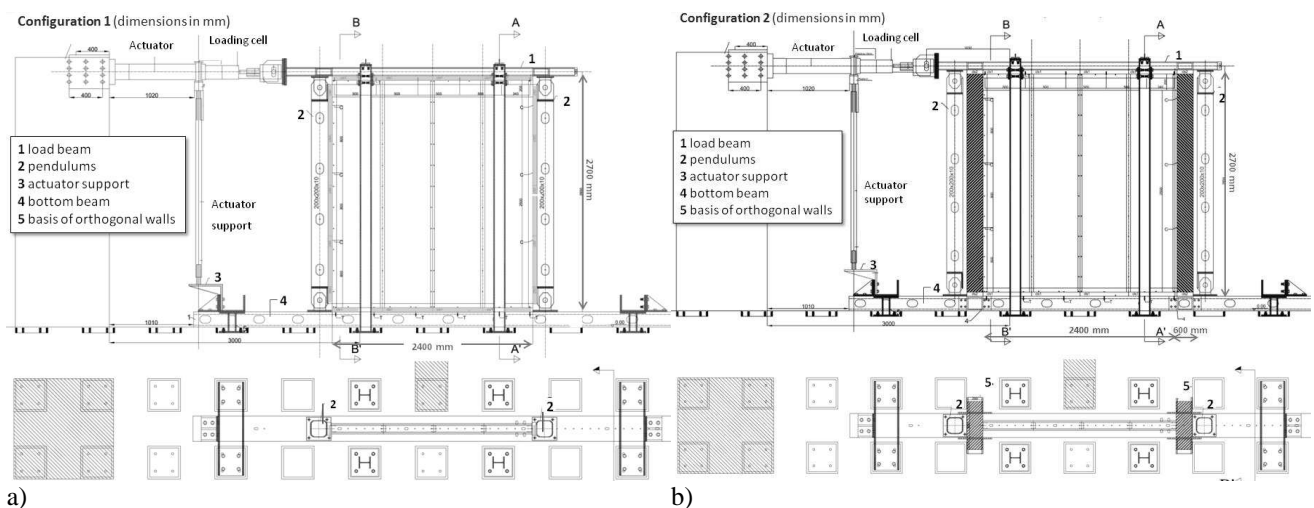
Test set-up for in-plane tests: a) single partition; b) subsystem composed by partition and outdoor drywall
